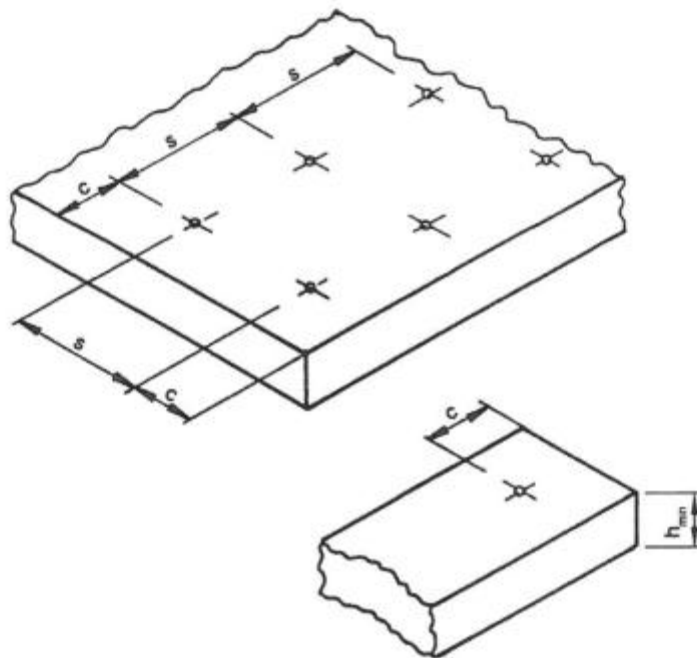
Layout parameters of steel expansion fasteners SM0WA / S-WA
